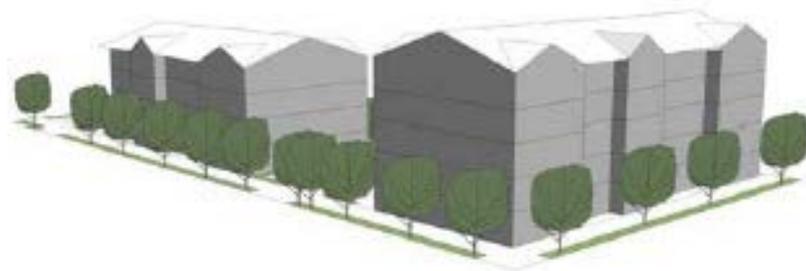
Multi-Story Street-Oriented Commercial Building
